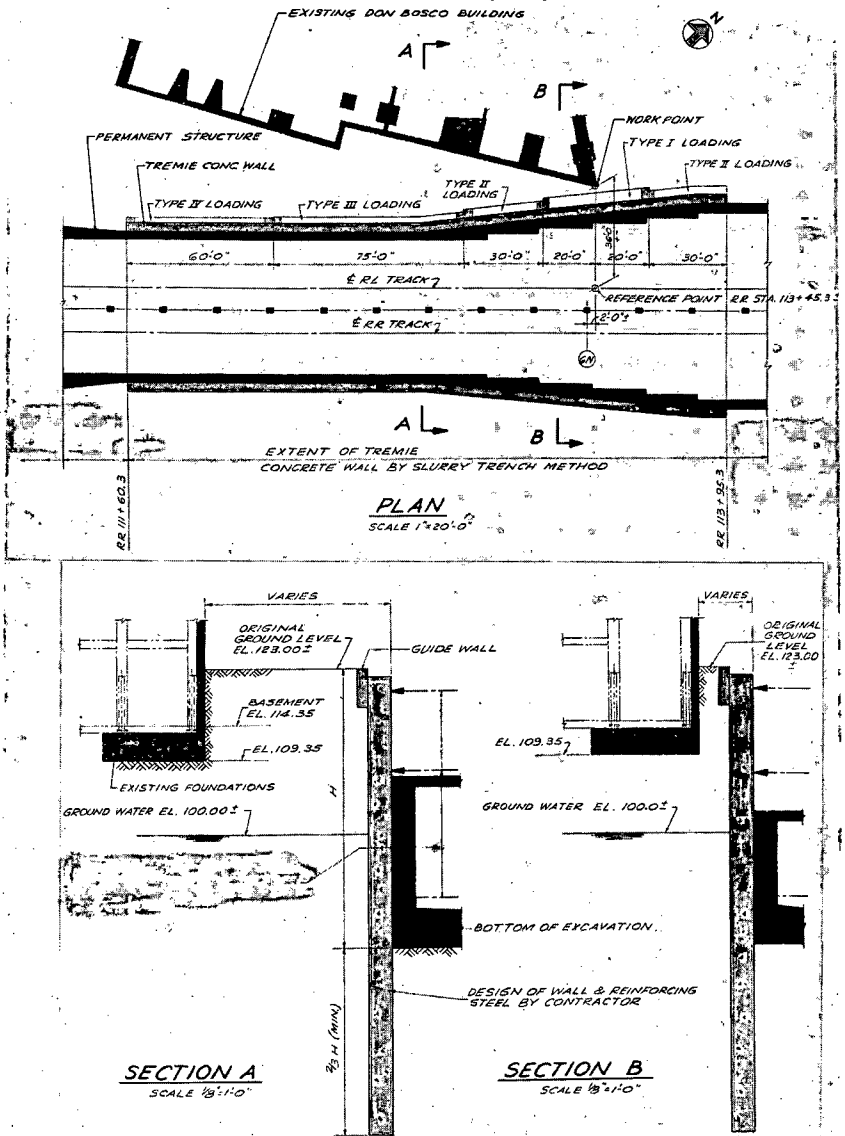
The reinforced tremie concrete cut-off walls for supporting the excavation adjacent to the Don Bosco High School will be installed by means of the bentonite slurry-trench method. 3000 p.s.i. tremie concrete will be used to displace bentonite slurry previously placed around reinforcing steel cages in the excavated slots. Within the 50-foot length of wall closest to the school, the maximum width of slot will be 10 feet.
